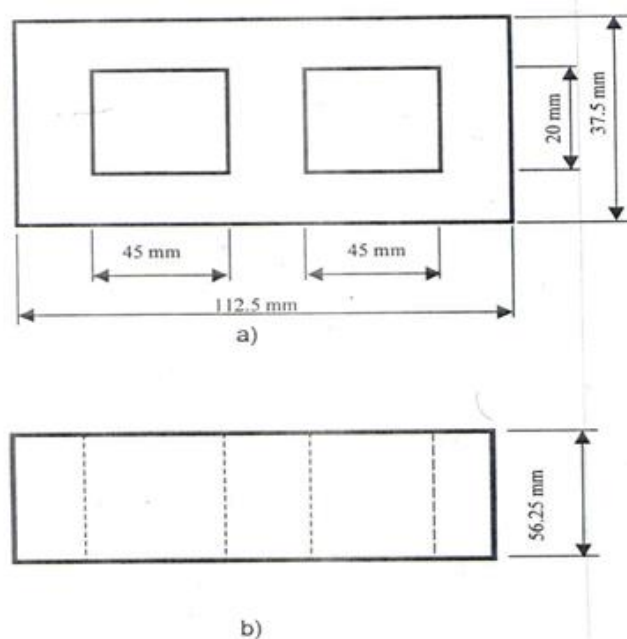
Dimensions of Model Sandcrete Block Unit( a) Plan view (b) Front view
